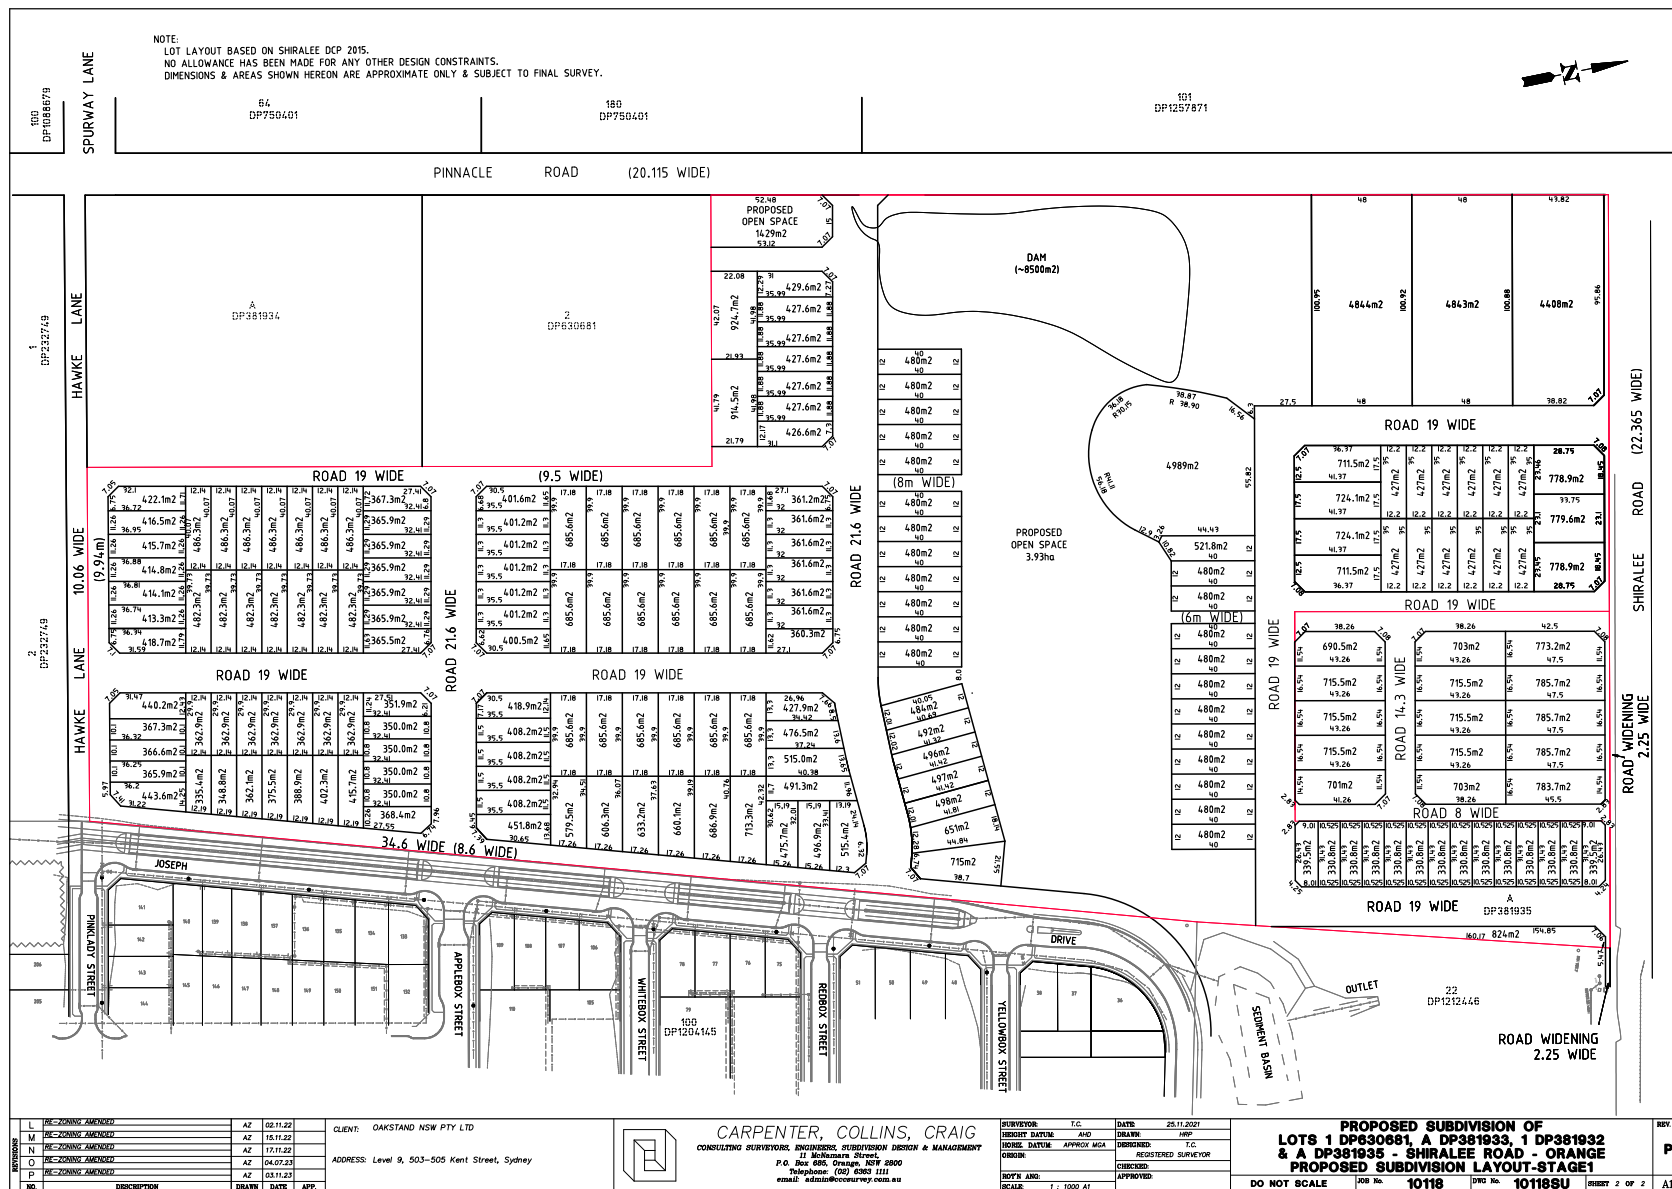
Proposed Plan of Subdivision - 12-20 Shiralee Road
